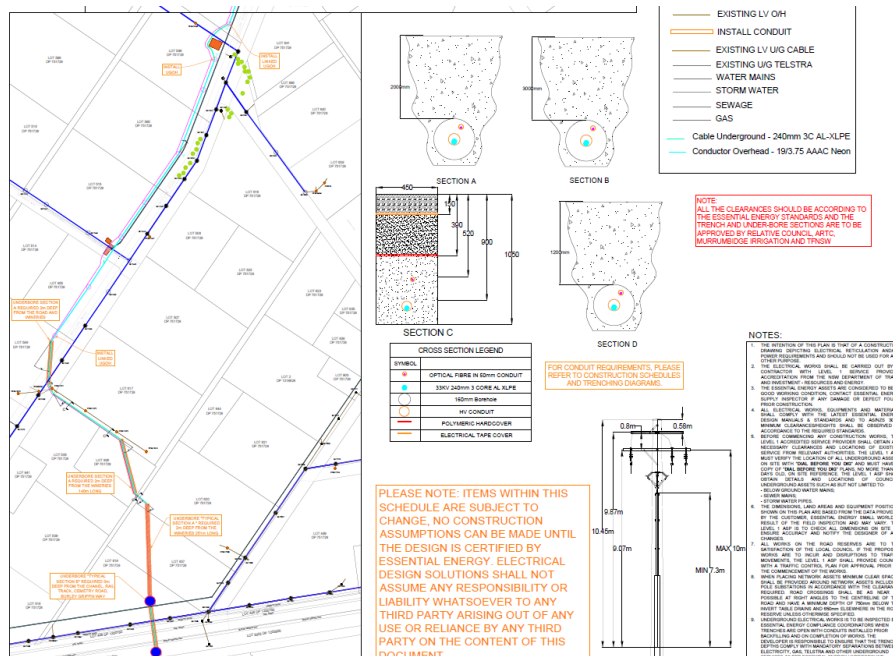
Underboring Concept. (Source: 2.Casella OH-UG Concept Plan NGE)
